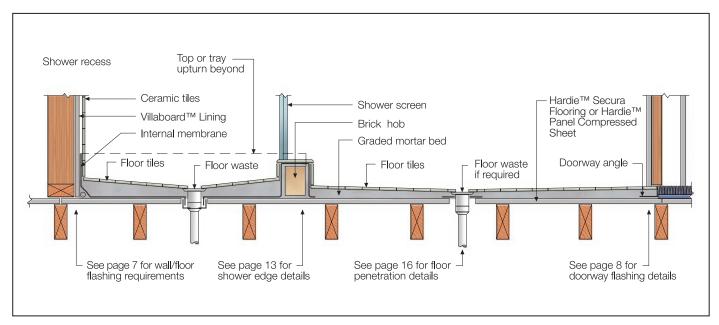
TYPICAL BATHROOM CROSS-SECTION
